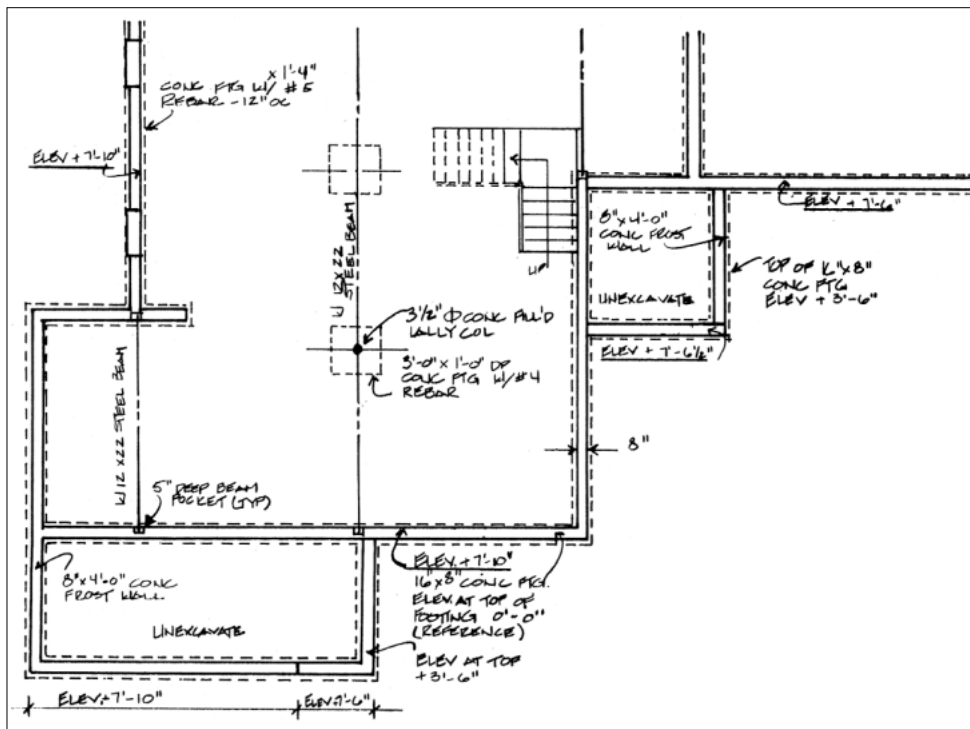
Vertical rise method. In this method, no fixed point is used. This portion of a residential foundation plan references elevations to the top of footings being designated at 0'0". With this method, however, it is easy to misjudge a building elevation.
